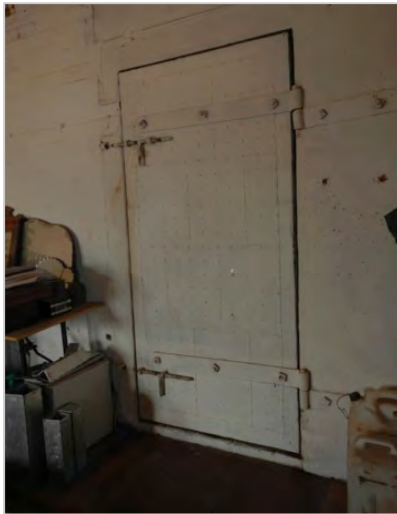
Mill building—second floor door to the inner section (© Kasiannan, 2015)
